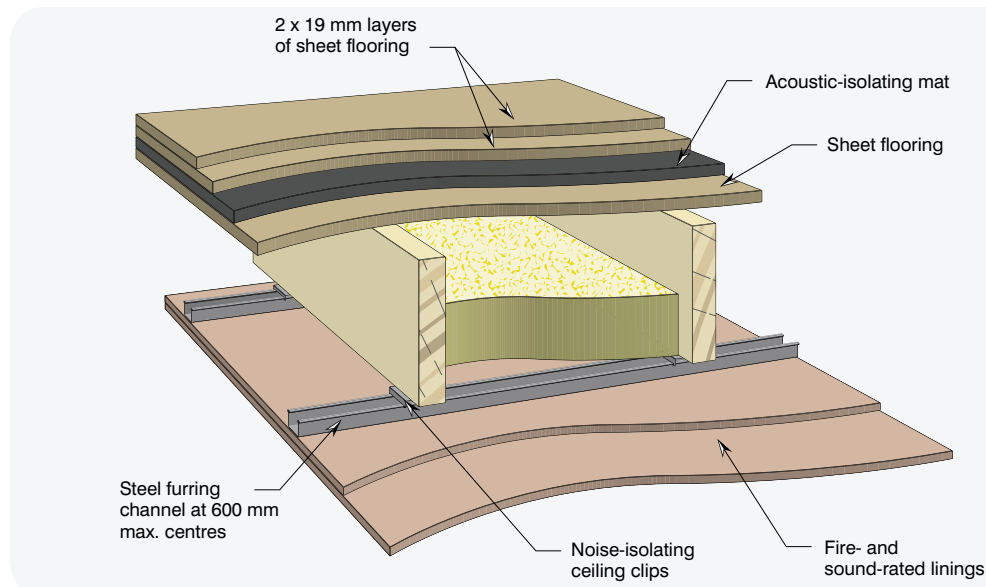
Adding mass to the floor system through the use of additional floor sheets.
